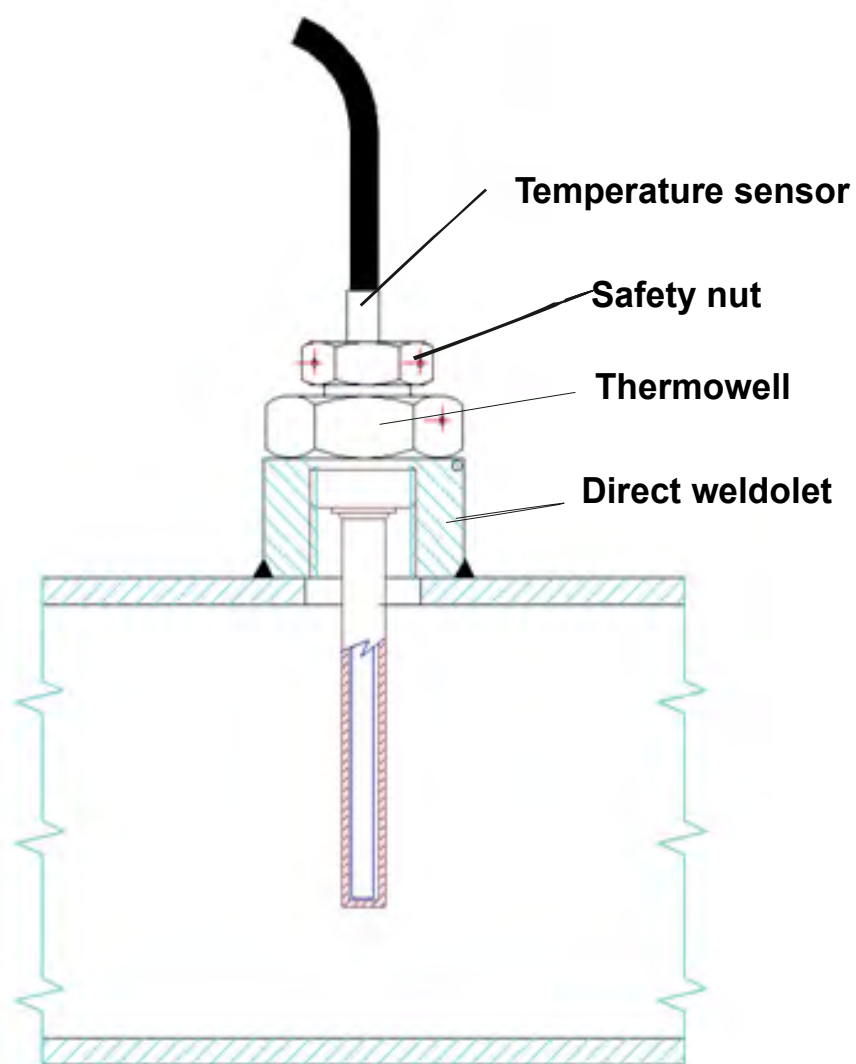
Temperature sensor mounting by the help of direct weldolet
